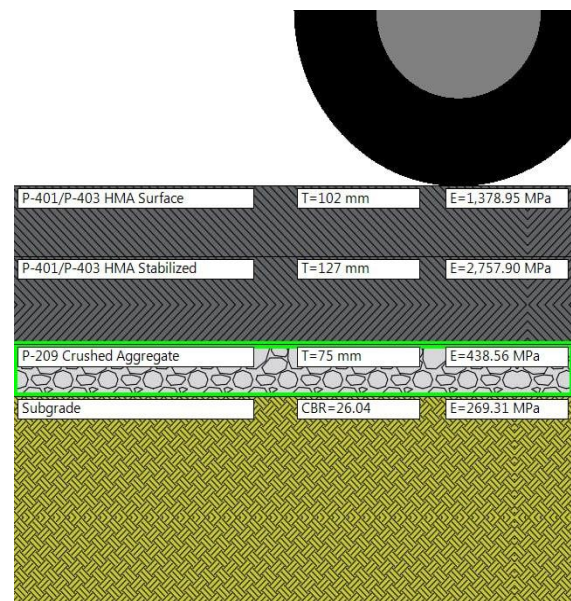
Pavement layer design result by FAARFIELD software (Flexible pavement).
